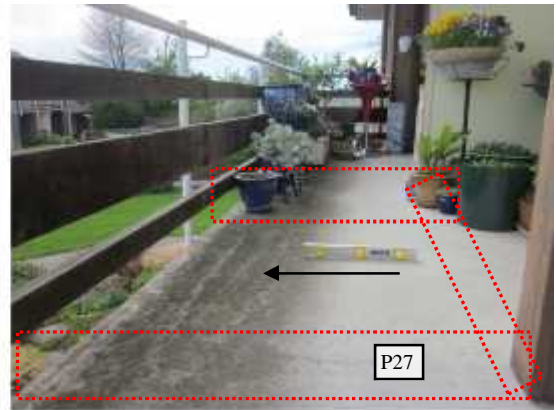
Block B - Cracks in concrete slab - upper floor balcony. Balcony sloping down to the left (likely on purpose).
